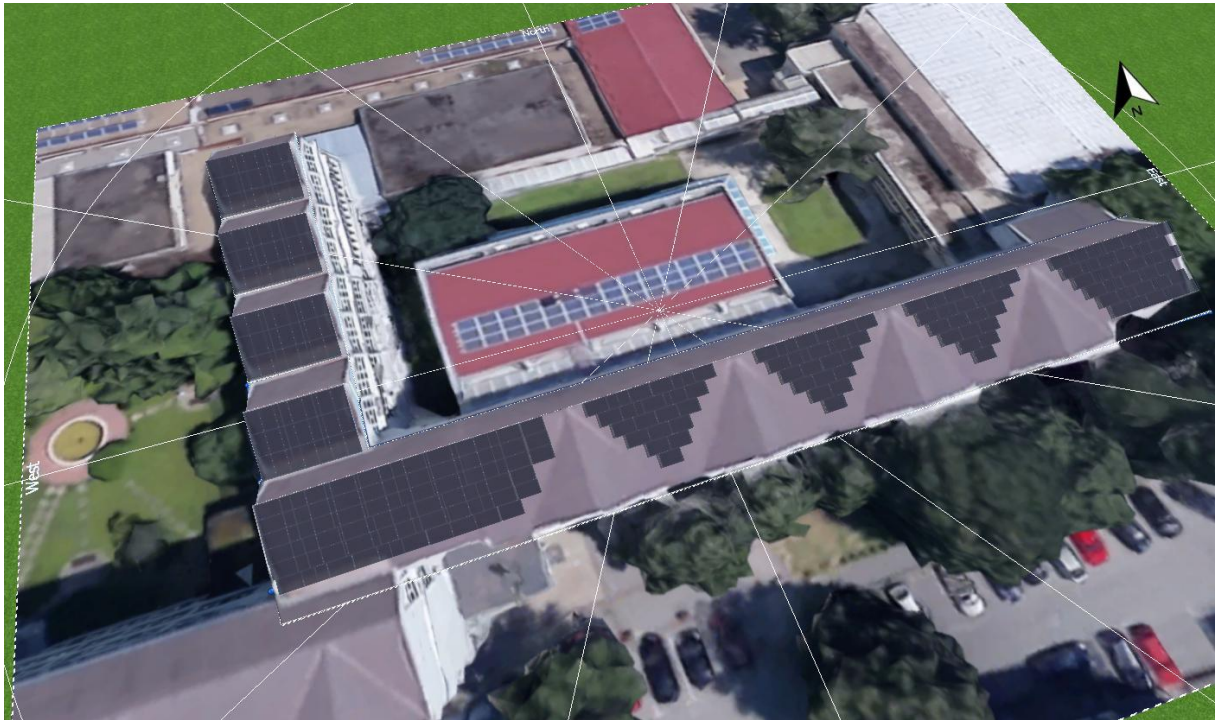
Preliminary 3D model of 75 kW PV system on building roof in Trpimirova street (with possible wall-mounted modules depending on roof shading)
